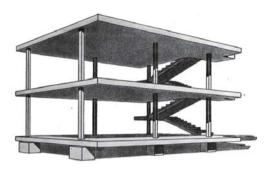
Loadbearing structure in concrete, with cantilevering floor slabs and bracing provided by the staircase Le Corbusier: Dom-Ino project, 1914
